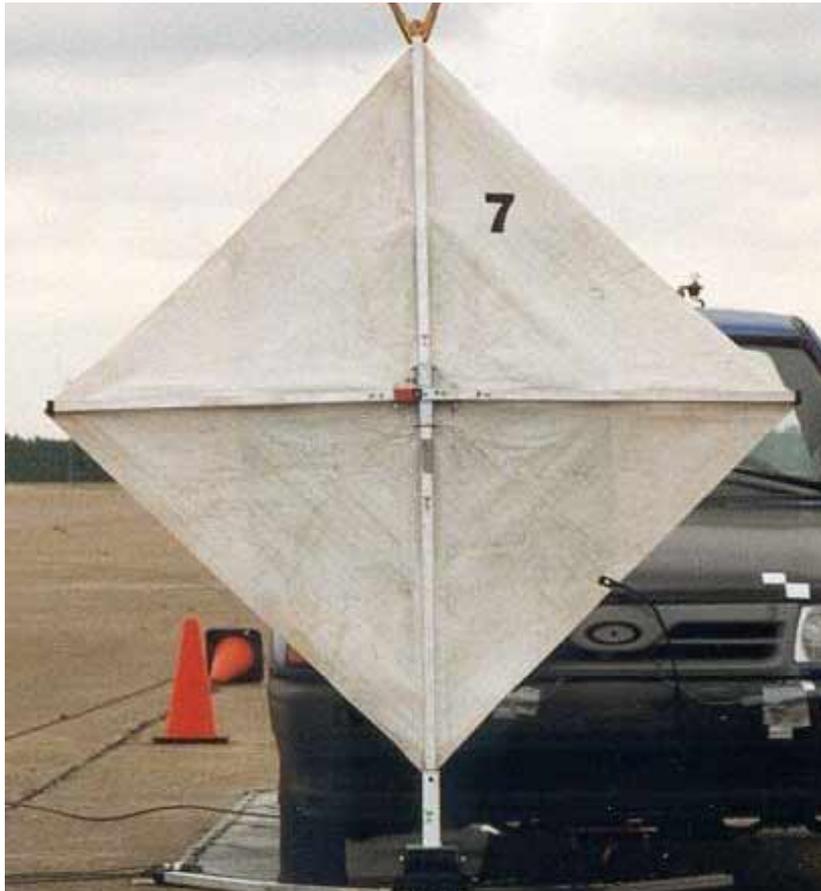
Material of horizontal crossbrace members: aluminum and fiberglass, respectively
